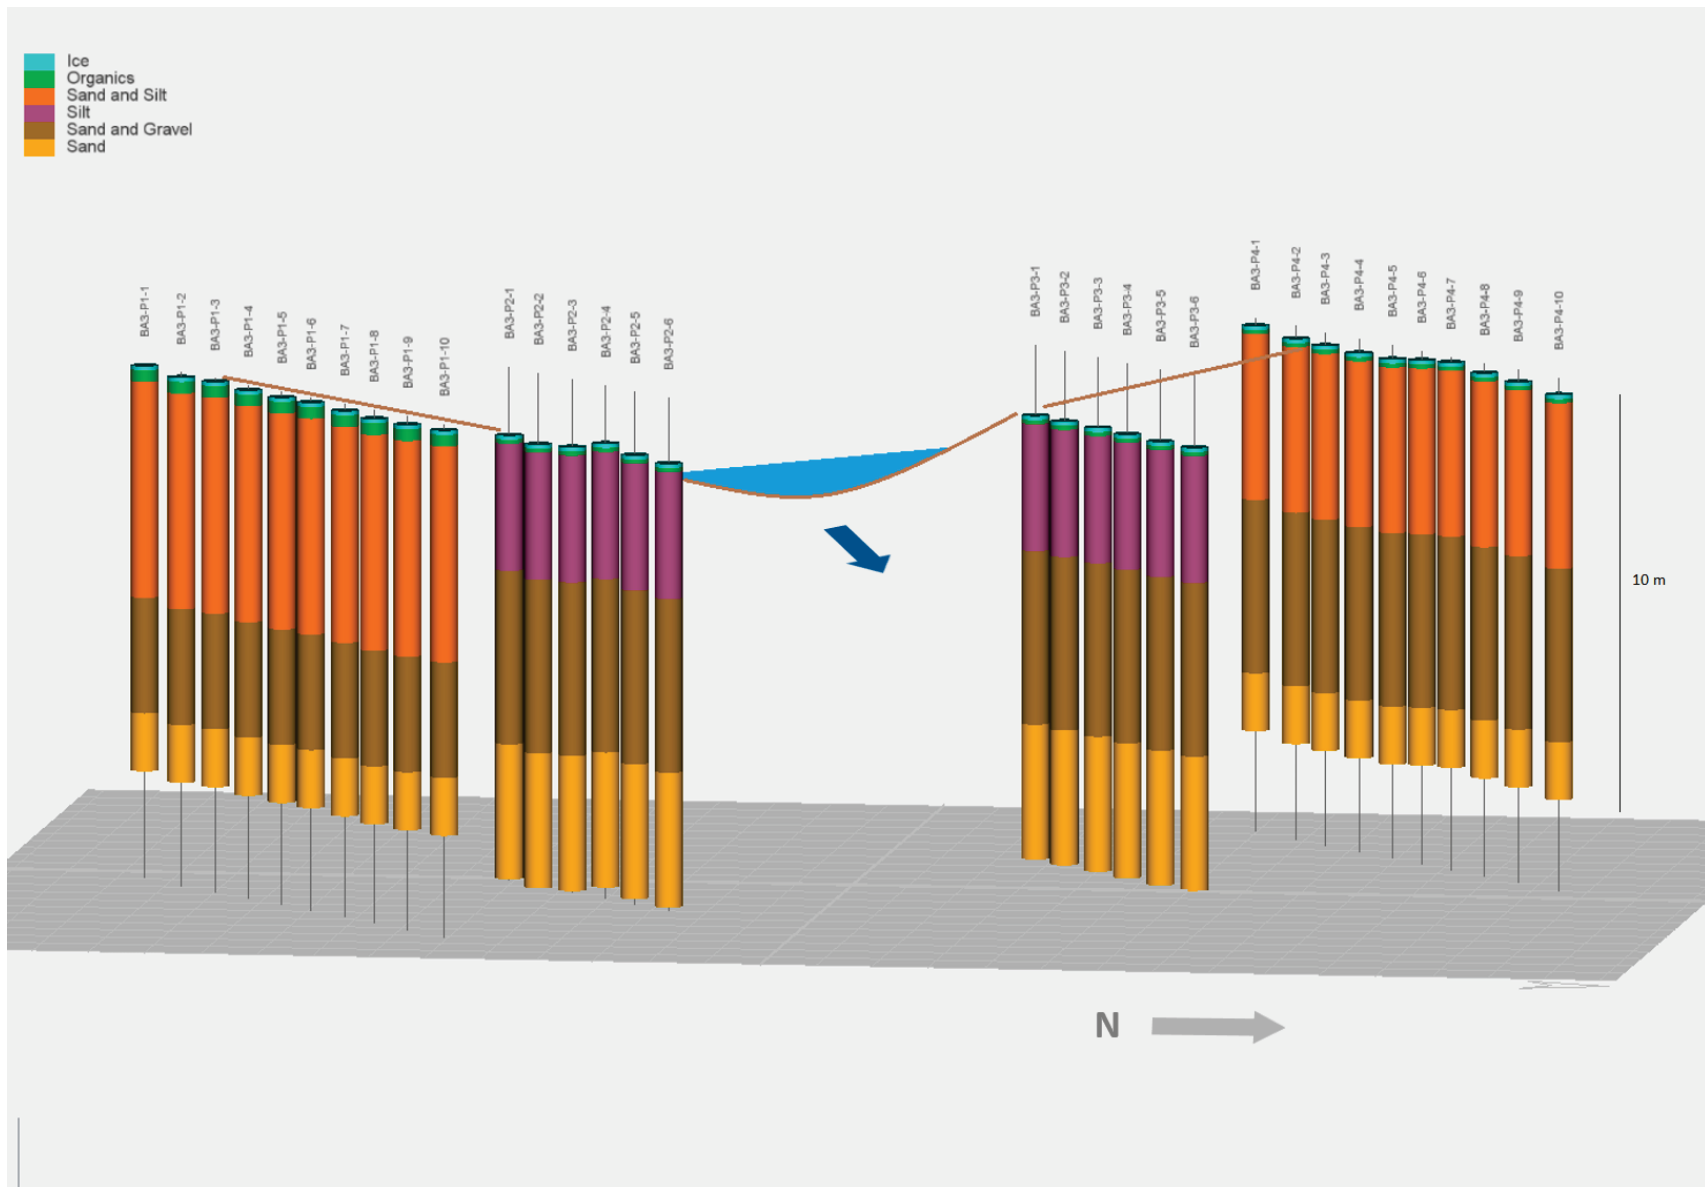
Bridge A3 - general substrate classes from piling installation records. The view is to the west-southwest of ITH km 104.1.
